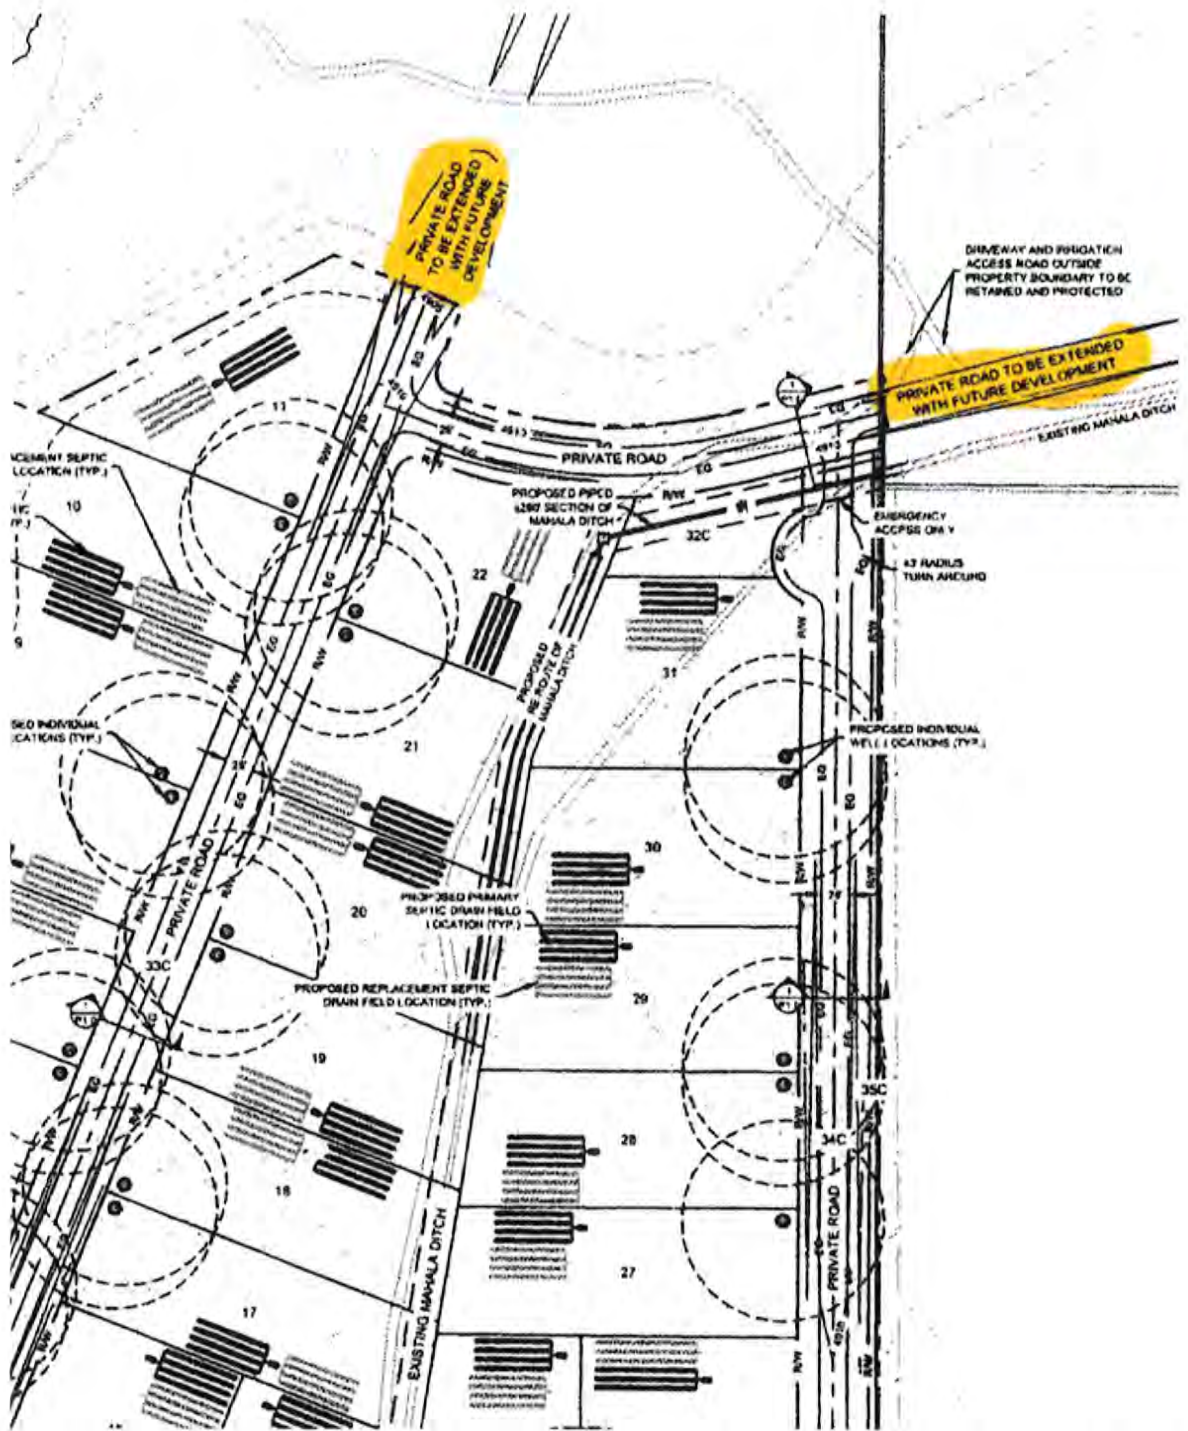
Excerpt of draft Preliminary Plat Septic Layout Provided to P&Z by Applicant's Project Engineer shortly before submittal of CUP 24-02, indicating extension of the two private roads with "future development" (available as public record).
